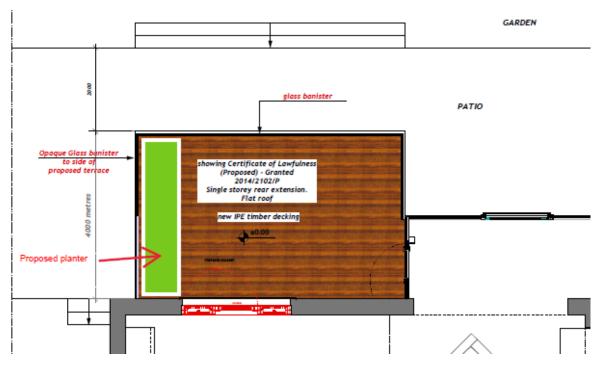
(above): Drawing of the first floor layout which shows the proposed balcony and deck, including the glass balustrades and planter.
